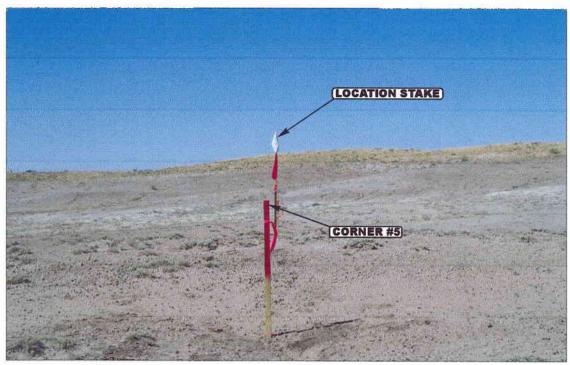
PHOTO: VIEW FROM CORNER #5 TO LOCATION STAKE
